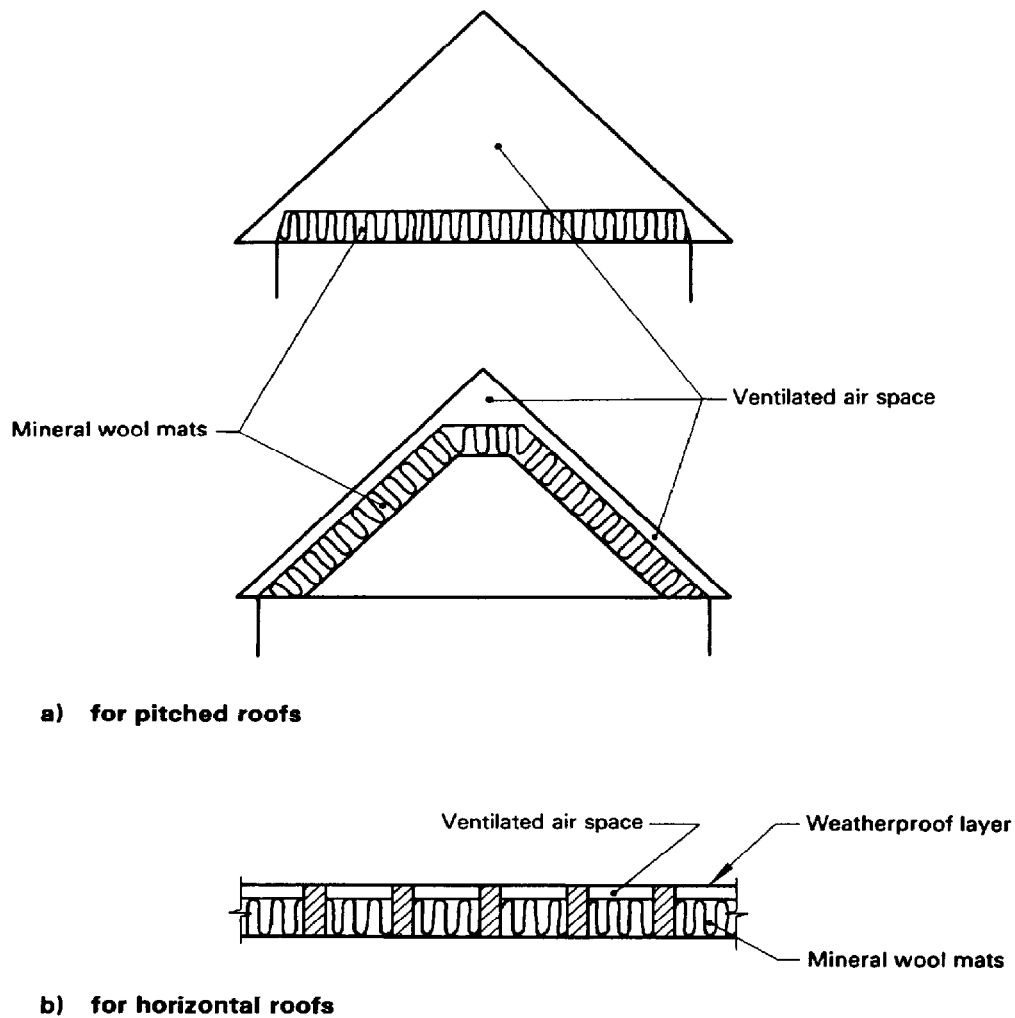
Typical locations for insulation in ventilated roof spaces
